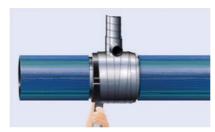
Wrapping the tapping fitting with aluminium adhesive tape
